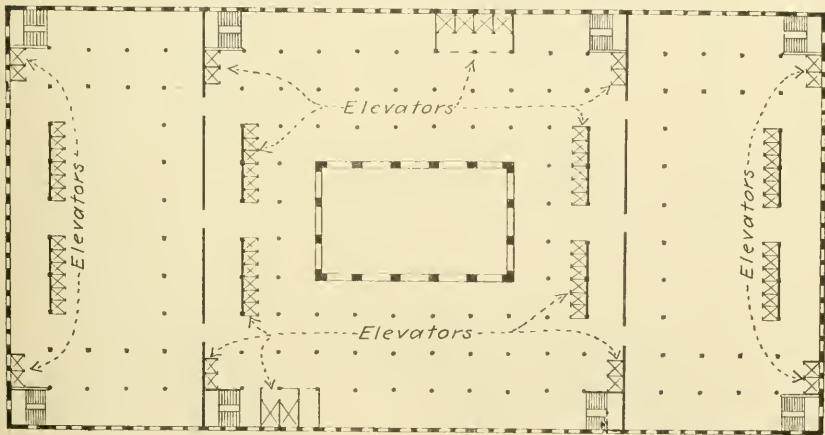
SUGGESTED ARRANGEMENT OF FIRE WALLS, ELEVATORS AND STAIRS FOR DEPARTMENT STORE
